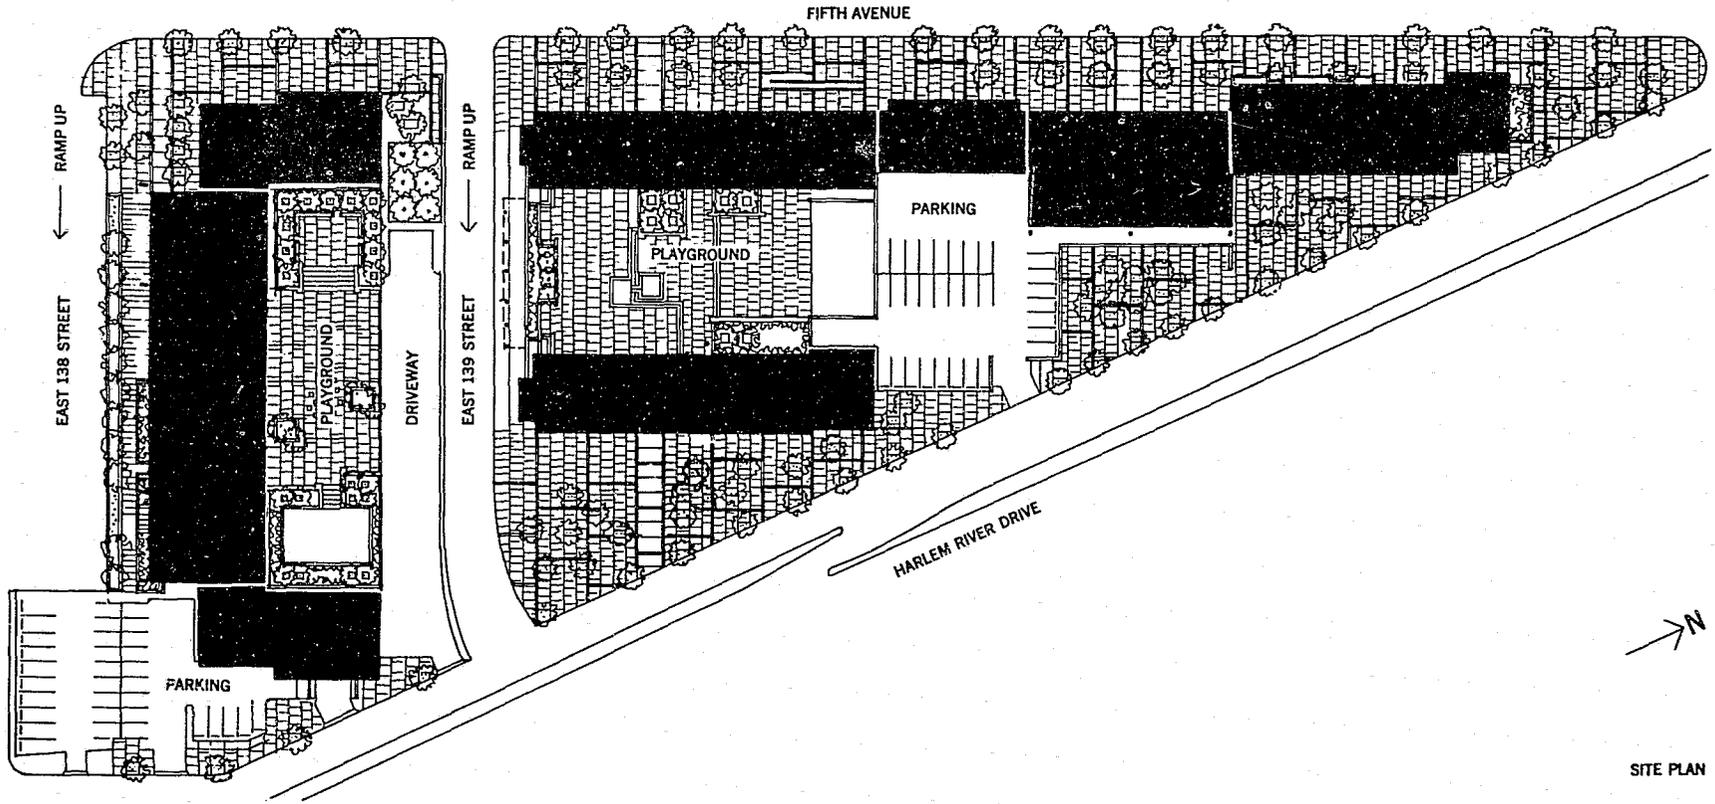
Riverbend Houses, New York, N.Y. Site plan.
